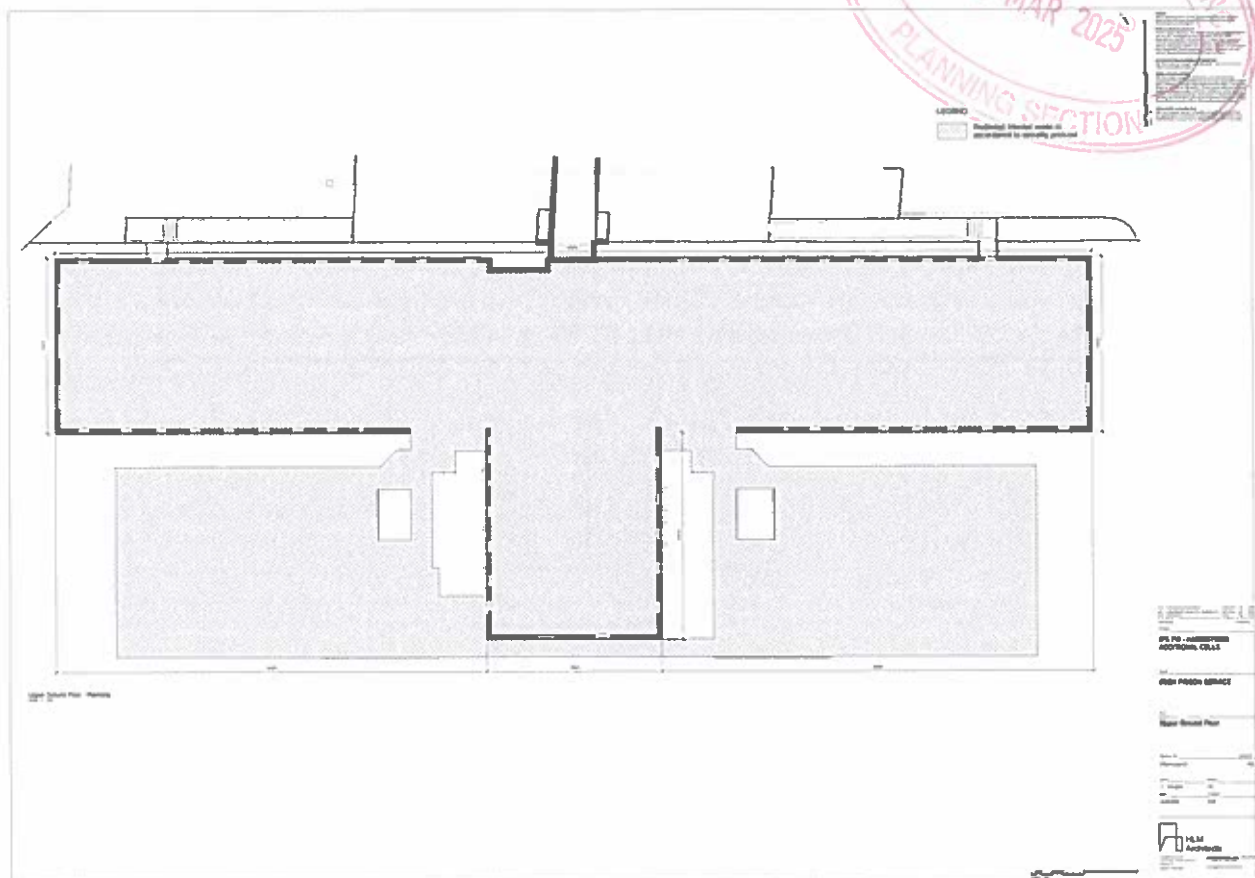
Harristown Block existing floor plan (Source: HLM Architects)
